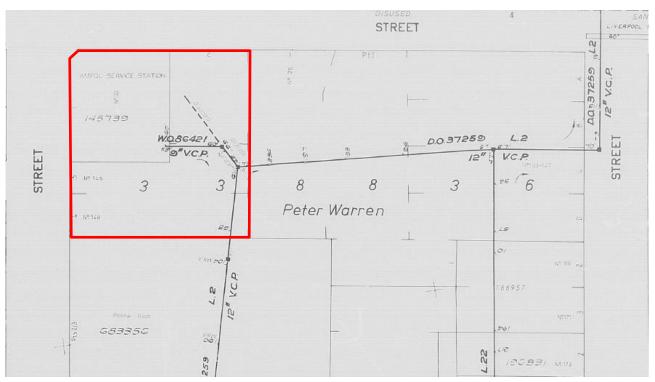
C.1969 Plan of the site showing Peter Warren Dealership and Ampol service station. Subject site indicated in red.
